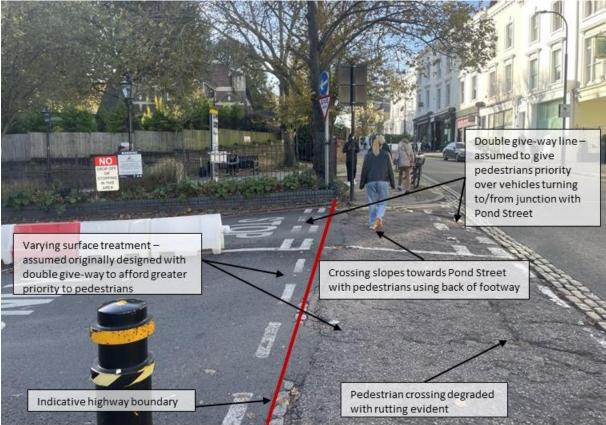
Observations about Pond Street / RFH Junction Car Park Waiting Area
